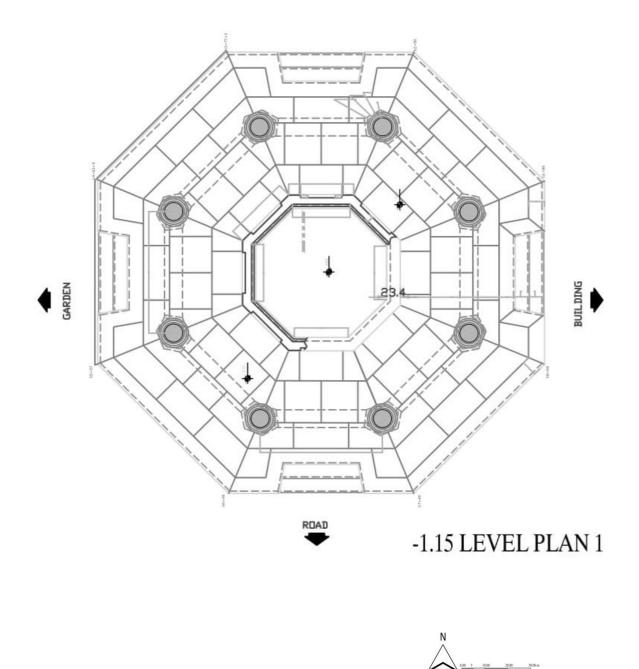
26. Water Distrubition Structure -1.15 level plan
